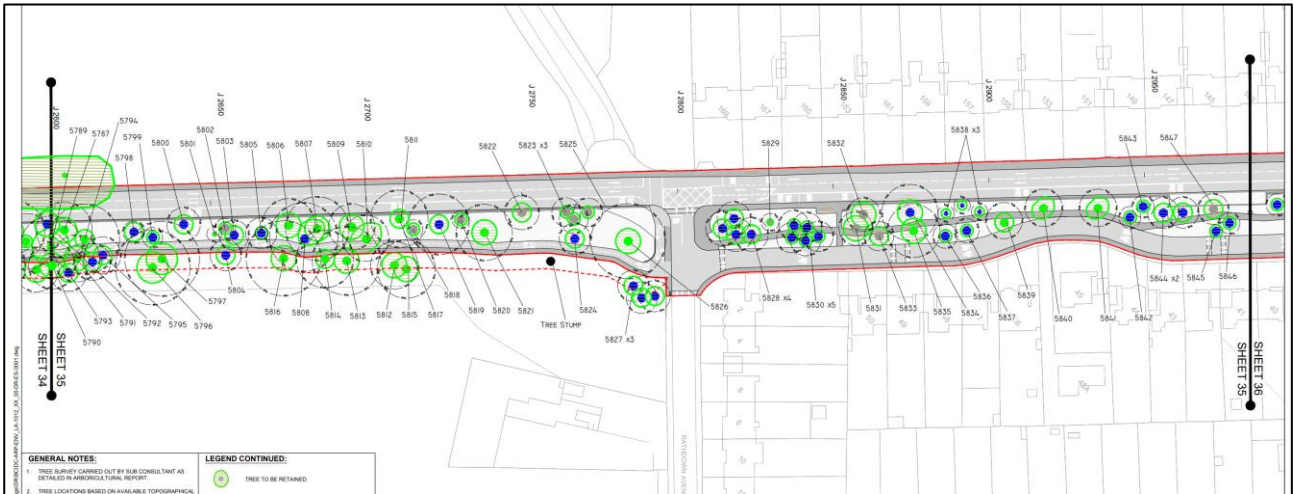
Extract from Tree Protection Plan Sheet 35 of 37
